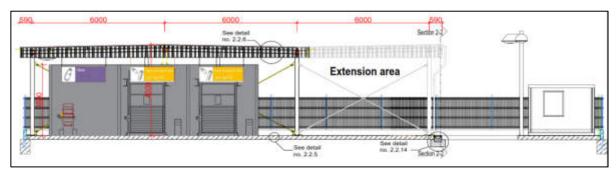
Cross section view of the ISWMC proposed in Guraidhoo
